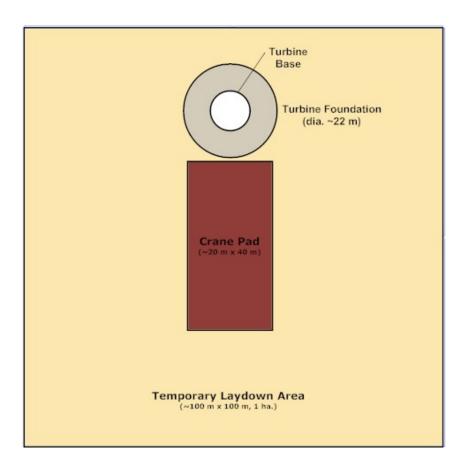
TYPICAL LAY-DOWN AREA AND CRANE PAD DESIGN
